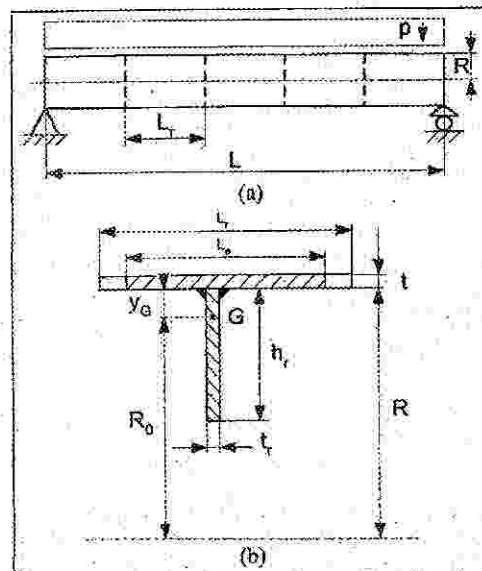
(a) Simply supported belt conveyor bridge constructed as a ring stiffened cylindrical shell, (b) Cross-section of a ring stiffener including the effective width of the shell.
